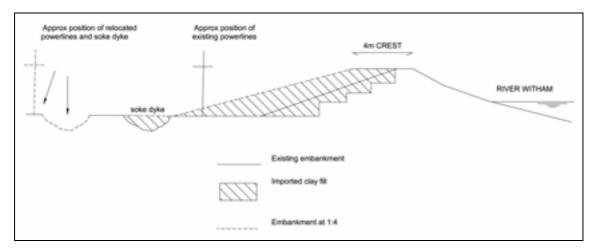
Unacceptable clay fill improvements to R. Witham embankment
